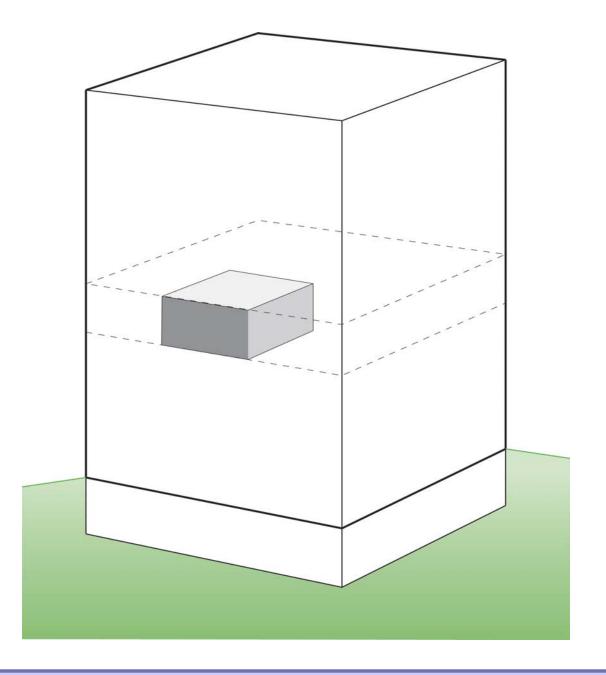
Apartment building with tighter apartment entry doors (Adapted from G.O. Handegord, 1998)
